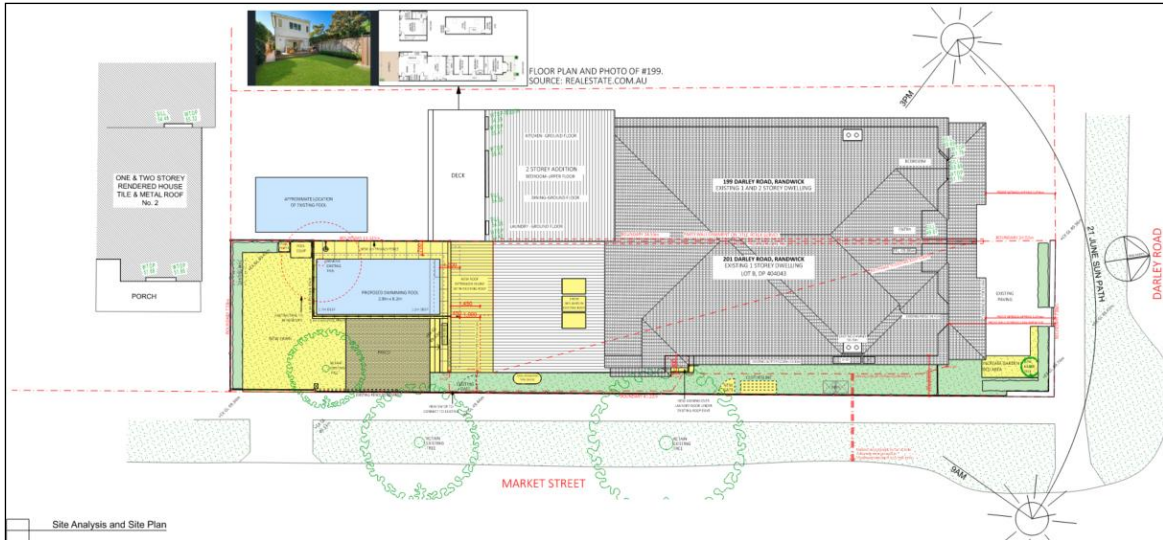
Proposed Site Plan (Source: Hatch Architects Pty Ltd, dated 17/02/2026)
